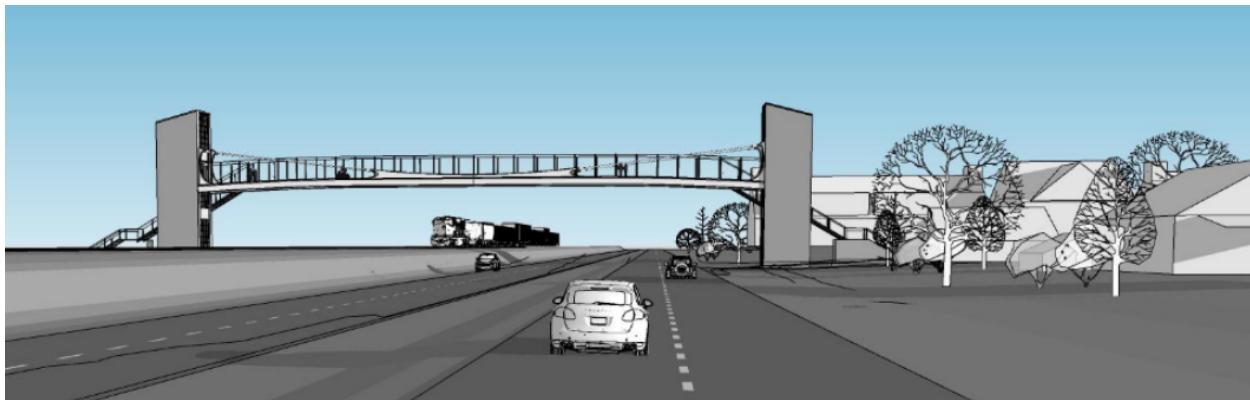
Hawthorne Avenue Concept 3: Stair and Elevator Bridge Access, No Ramps
